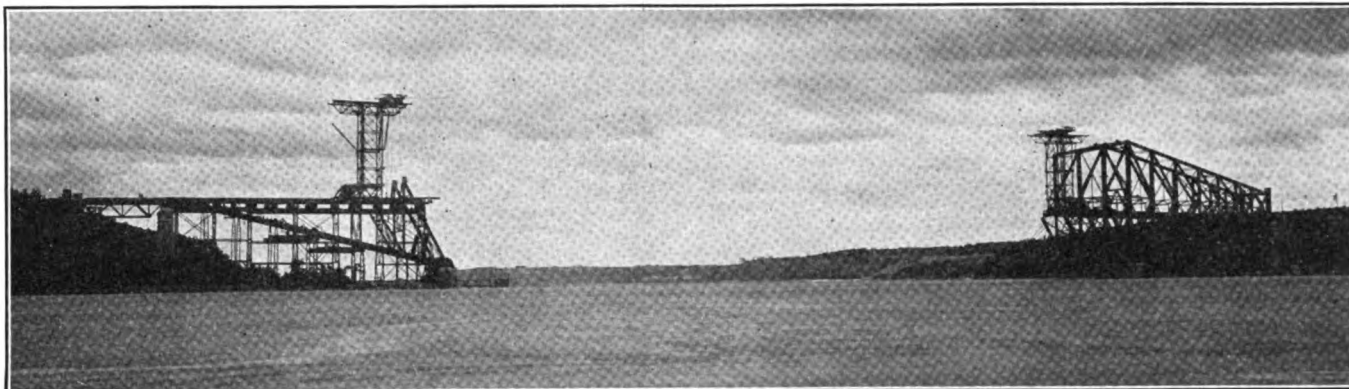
PRESENT STAGE OF ERECTION OF QUEBEC BRIDGE
